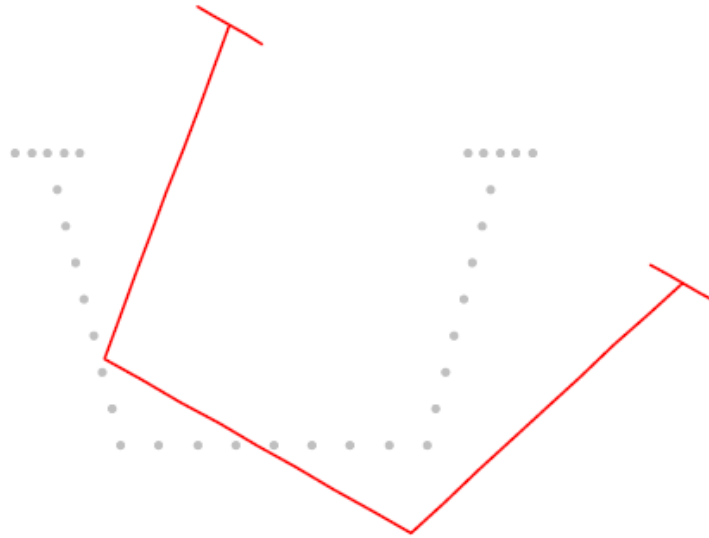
UTrap Cross-Section of Collapsed Marcy Bridge (Popp 2004)
